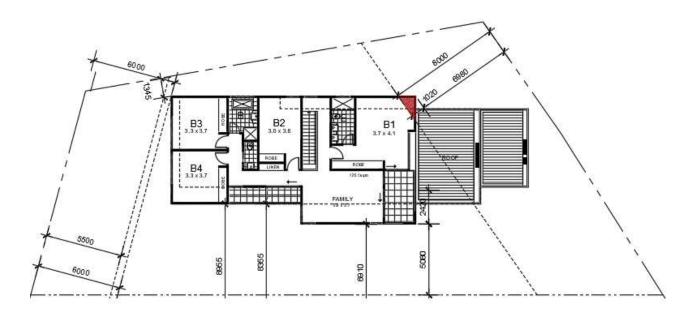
Demonstrating the minor encroachment within the 8m rear setback required to two storey dwellings
